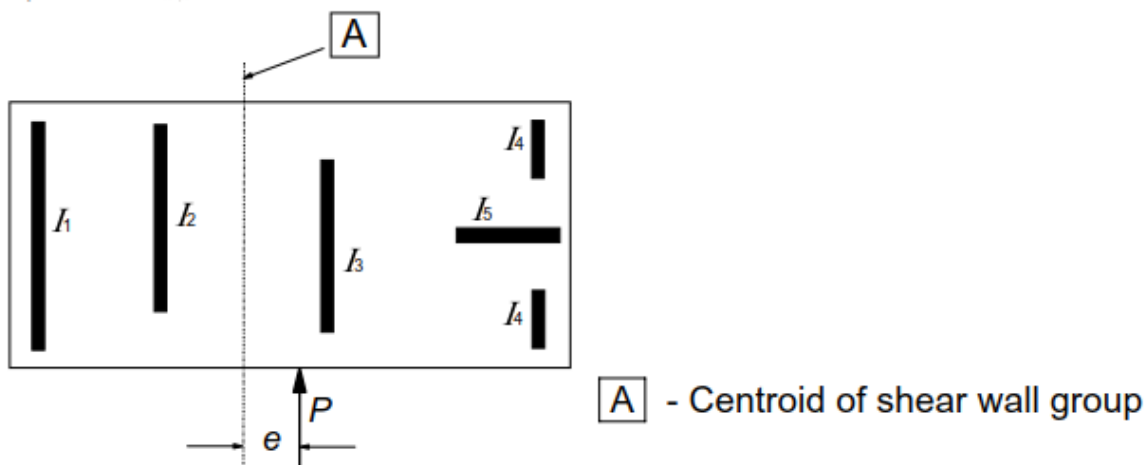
Shear walls marked with thick black lines in a building, with load P , centroid of shear wall group $[A]$ and eccentricity e displayed (Source: [9]).
